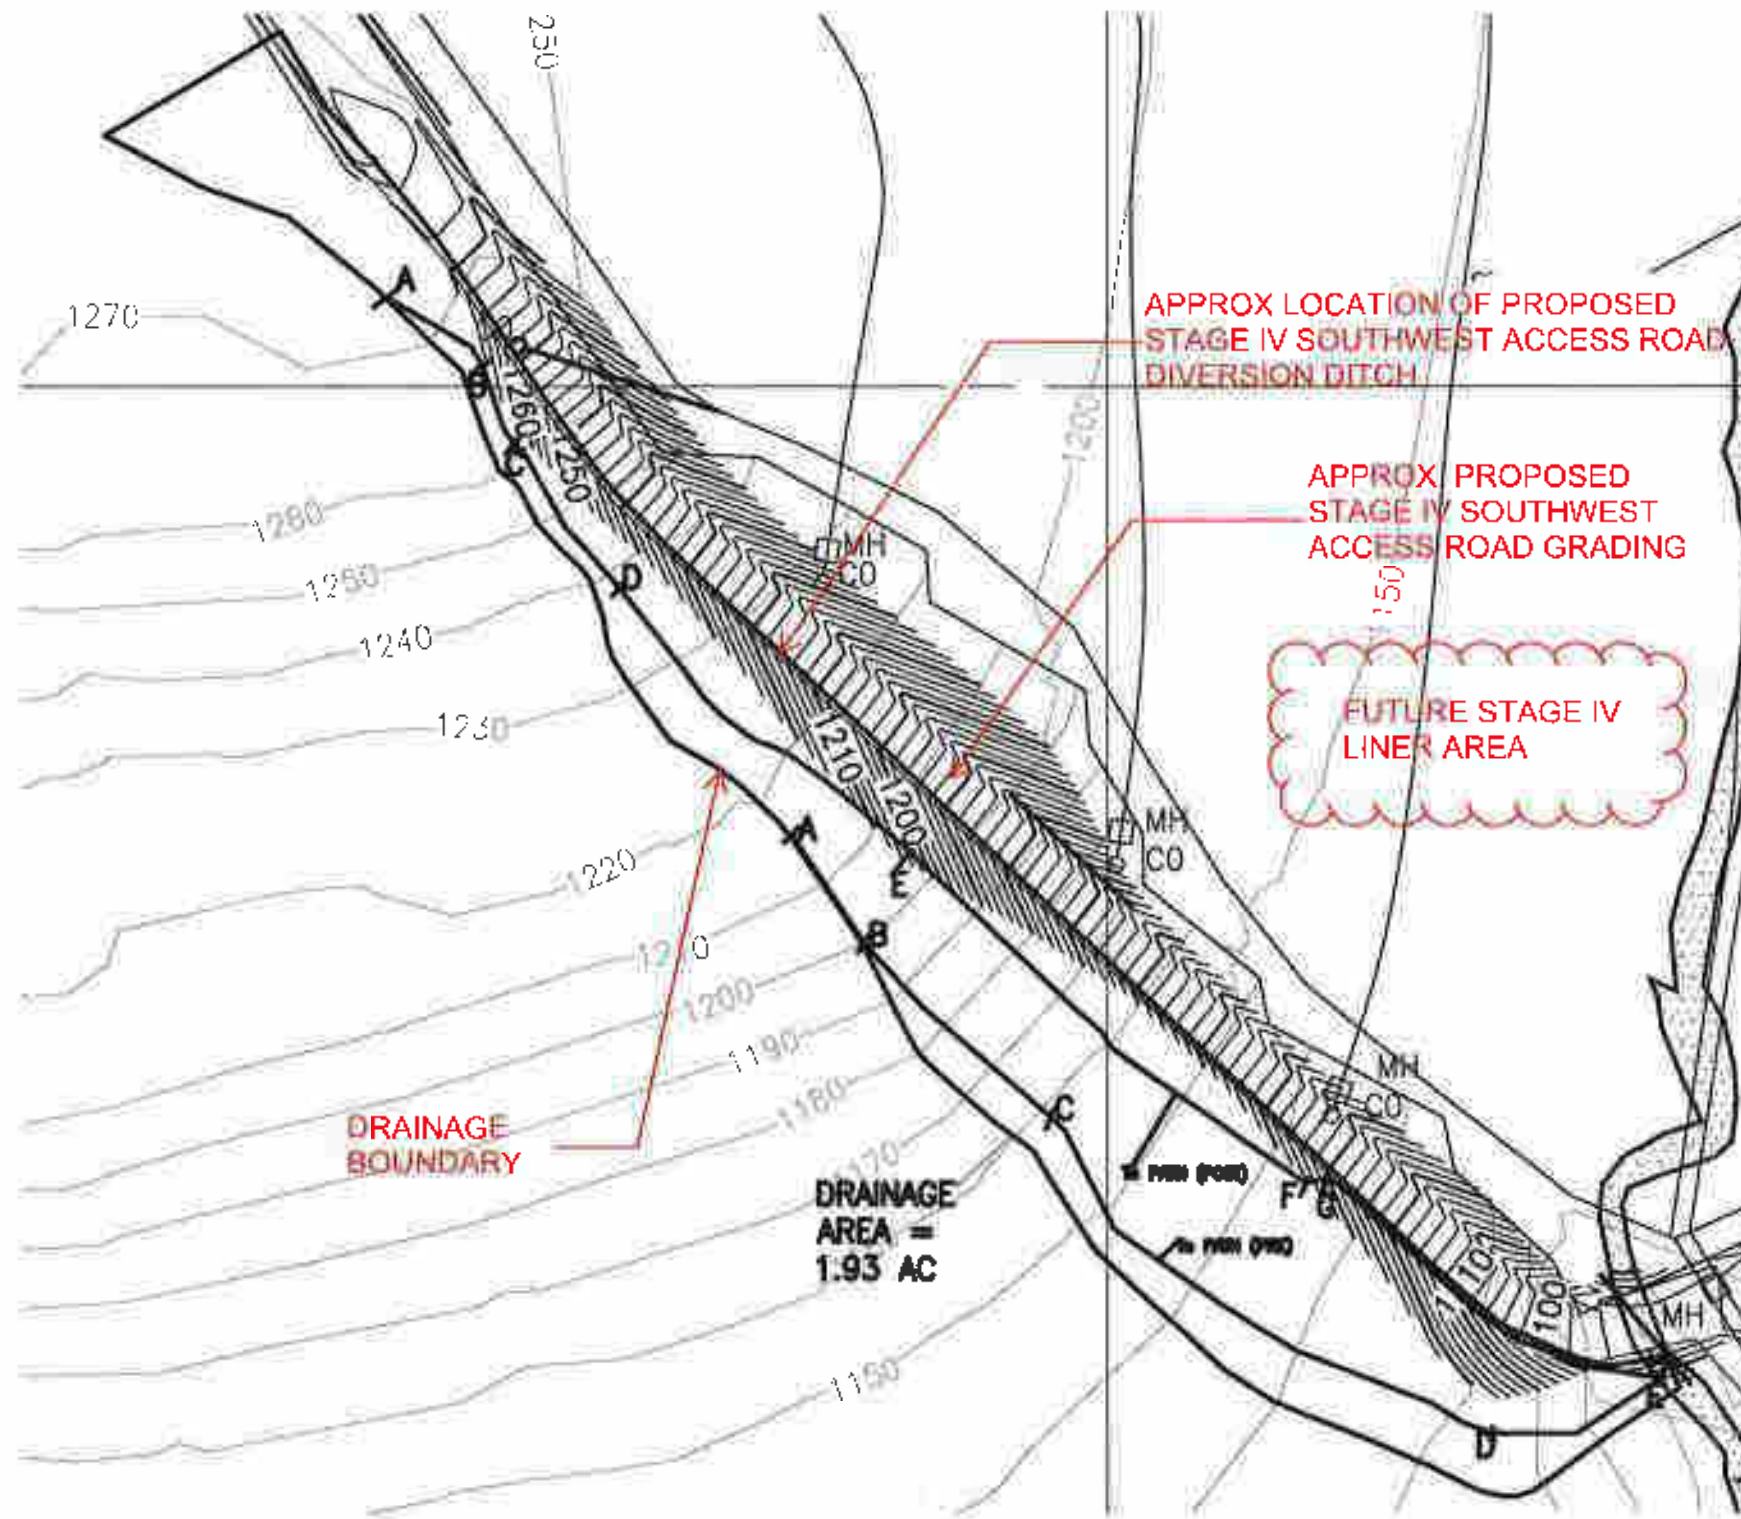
PROPOSED CULVERTS 18 AND 19 DRAINAGE WORKSHEET
